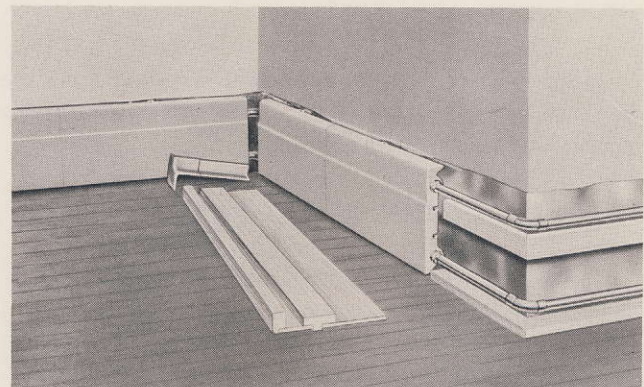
Matching wood baseboard used around corner. Note that sealing strip is recommended here, too.
